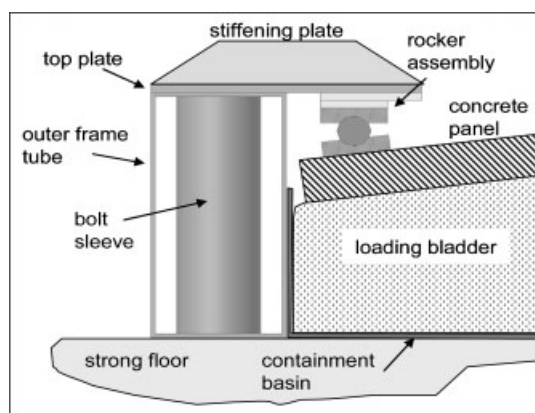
The test frame: the cross-section showing the frame construction, loading bladder, and specimen
